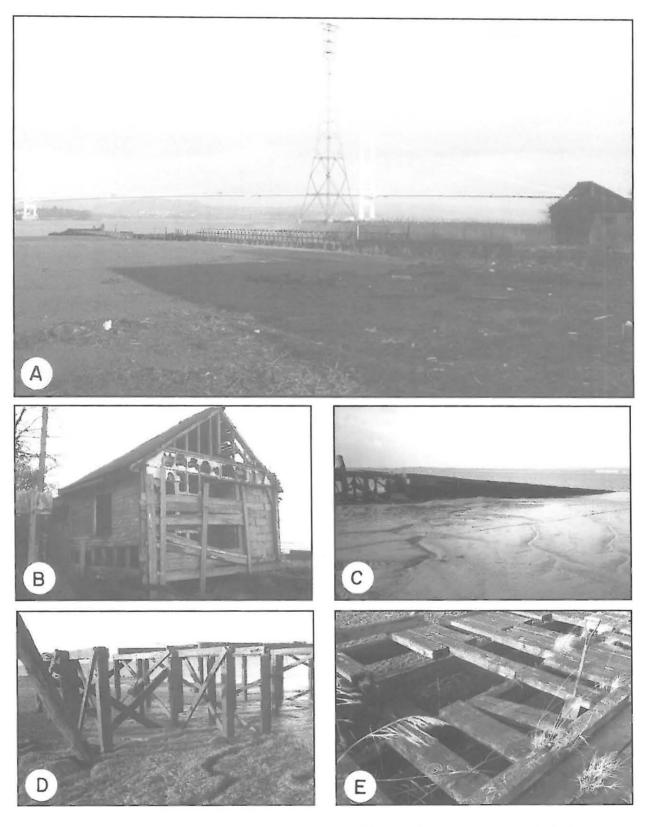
Pier 4. A, general view from south. B, toll-house from the north-east. C, low-water pier from the east. D, framework of timber causeway connecting high-water and low-water piers. E, longitudinal timbers and decking for vehicles and foot-passengers on timber causeway from the east (spade for scale).
